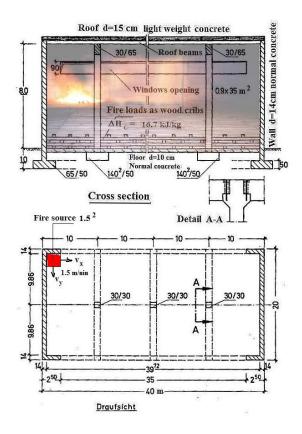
Geometry of the investigated reinforced concrete hall building
